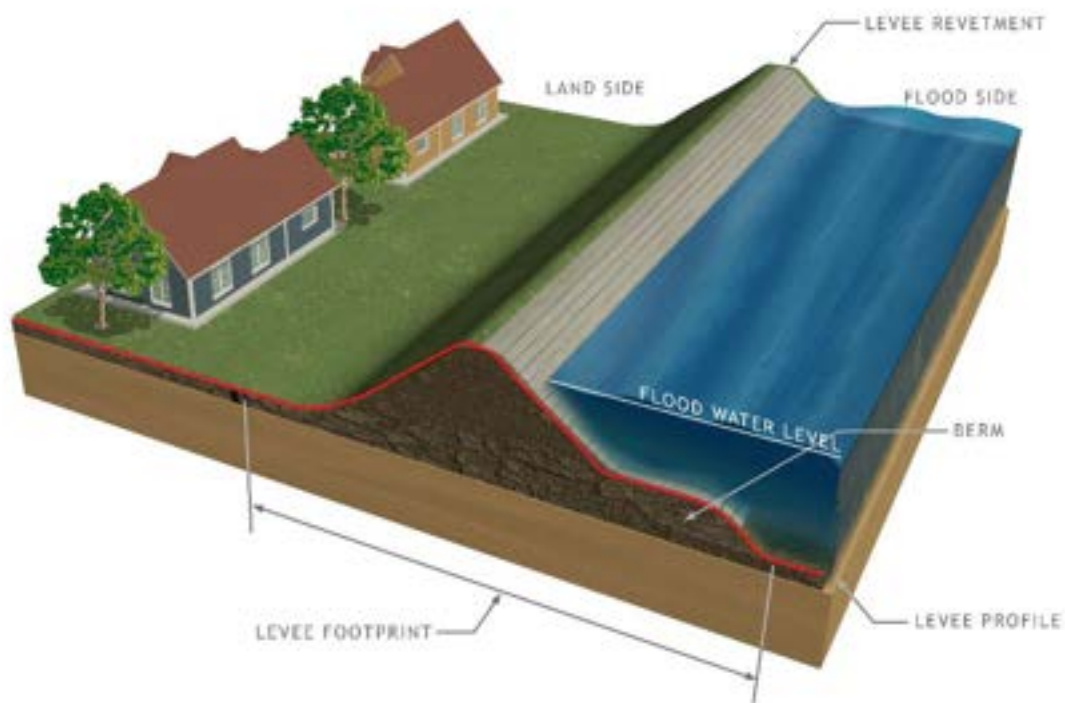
Example of additional levee reinforcement to prevent flooding within inland areas.
